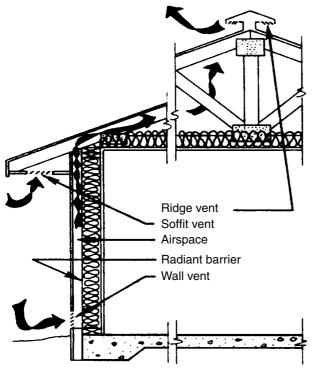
Vented radiant barrier wall section. (Bynum)
